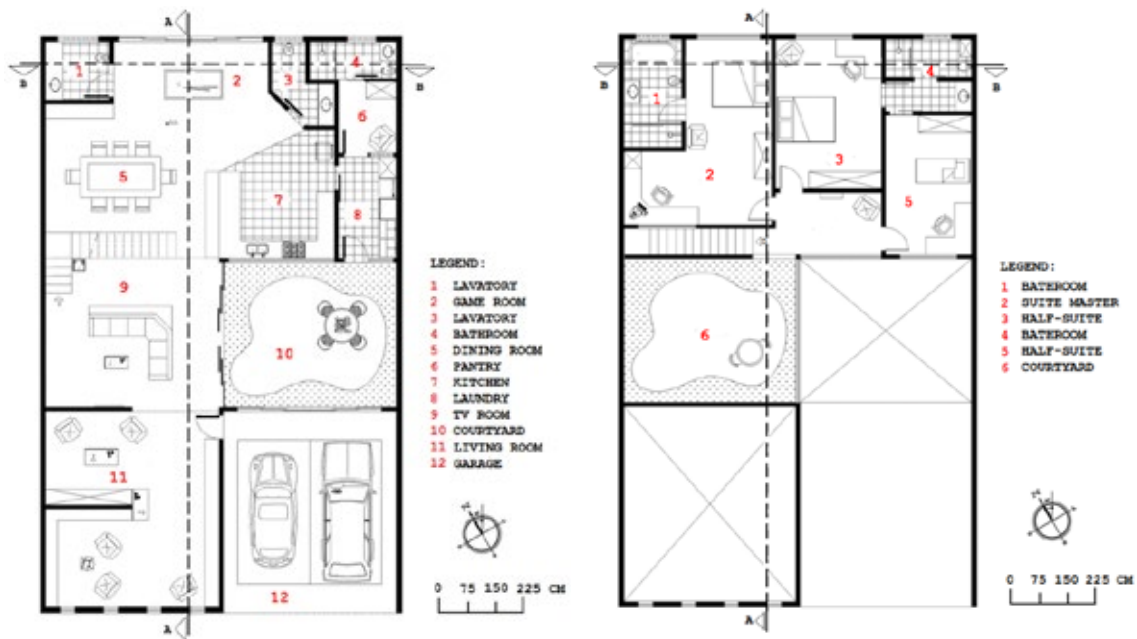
Plan views of the house project. At left the 1st pavement and at right the 2nd one
